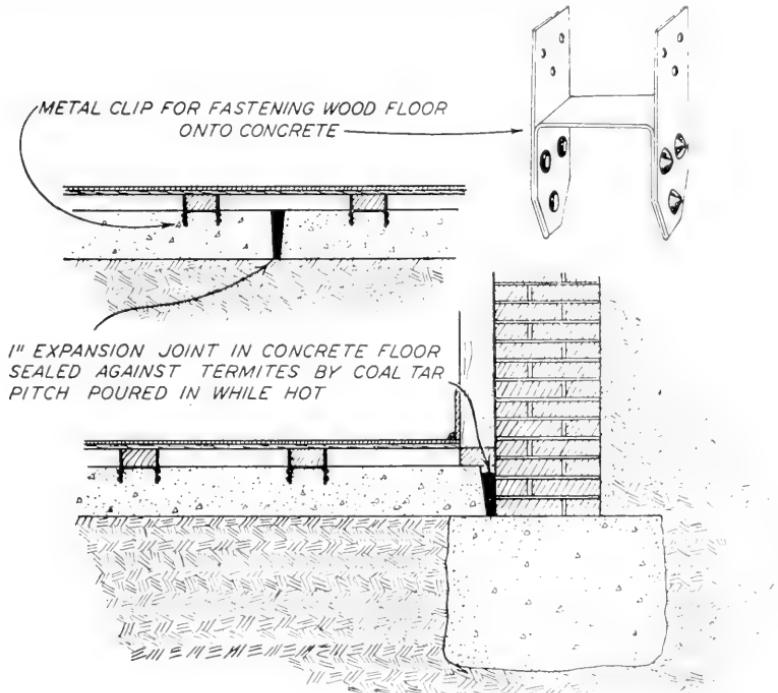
Expansion joints between sections of concrete and between concrete and masonry wall sealed against termite entry with hot coal tar pitch. This type of seal is very simple yet effective in protecting a building at a common point of termite entry. The clip illustrated is one of many types manufactured for the purpose of fastening sleepers to concrete floors, thereby eliminating the older method of embedding these timbers in concrete. An alternative type of joint is shown in fig. 13.
